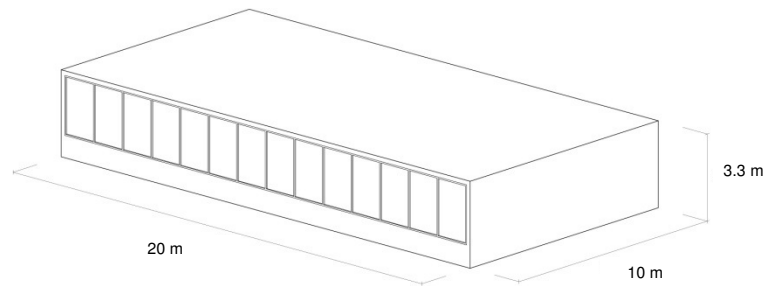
Model of the landscaped office building used in the calculations in BuildingCalc/LightCalc.
